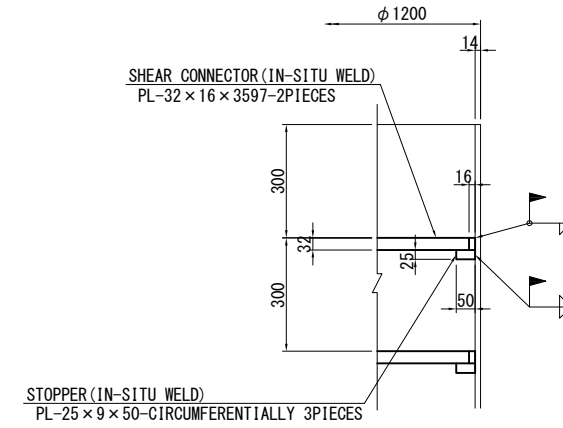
DETAIL OF ATTACHMENT OF SHEAR CONNECTOR
